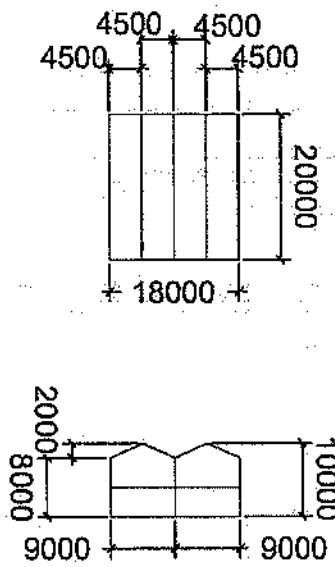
Plan and typical elevation for existing transit store (BLDG 669)
